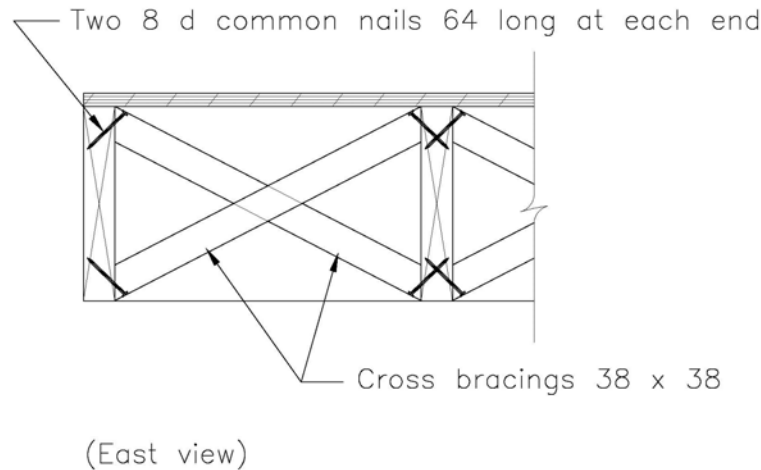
Solid wood joist layout details (all dimensions in mm).
